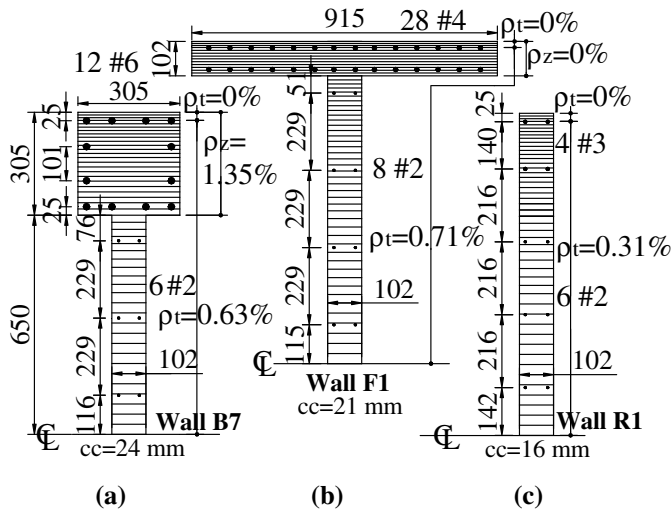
Sectional models for PCA walls: (a) barbell; (b) flange; (c) rectangular
